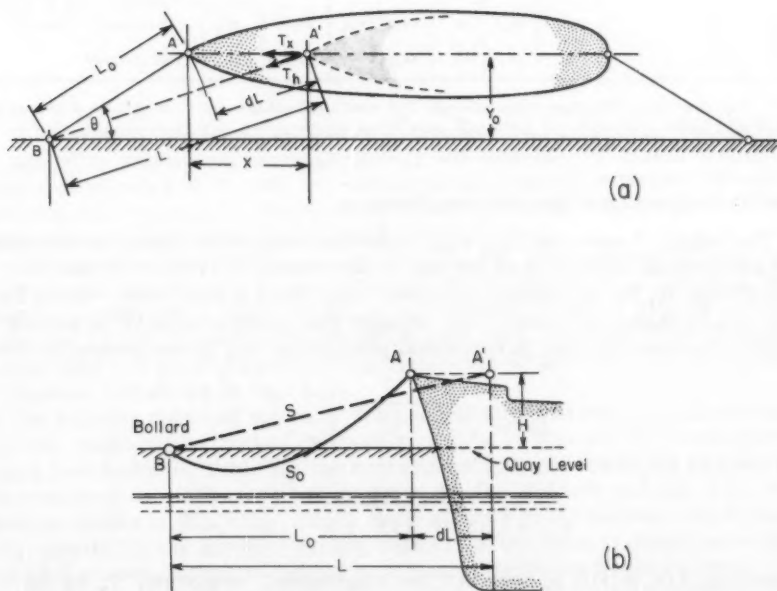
Mooring line geometry: (a) plan view of ship showing sternward surge translation  $X$ ; (b) side elevation view of ship projected in the vertical plane of the ropes
